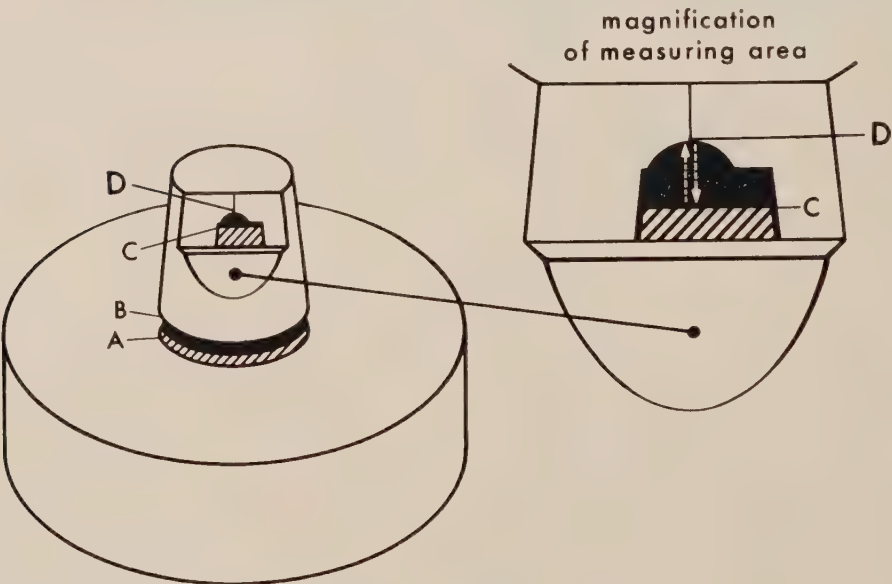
Components of die and casting. A, base of die. B, base of casting. C, top of die. D, pin reference point for all measurements.
